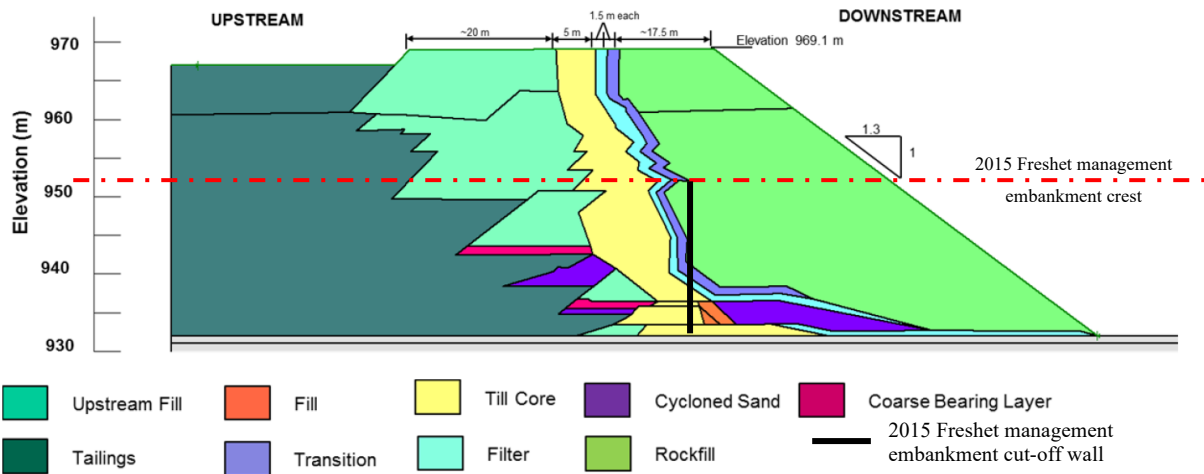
Perimeter embankment typical section and 2015 freshet management embankment cut-off wall approximate location
